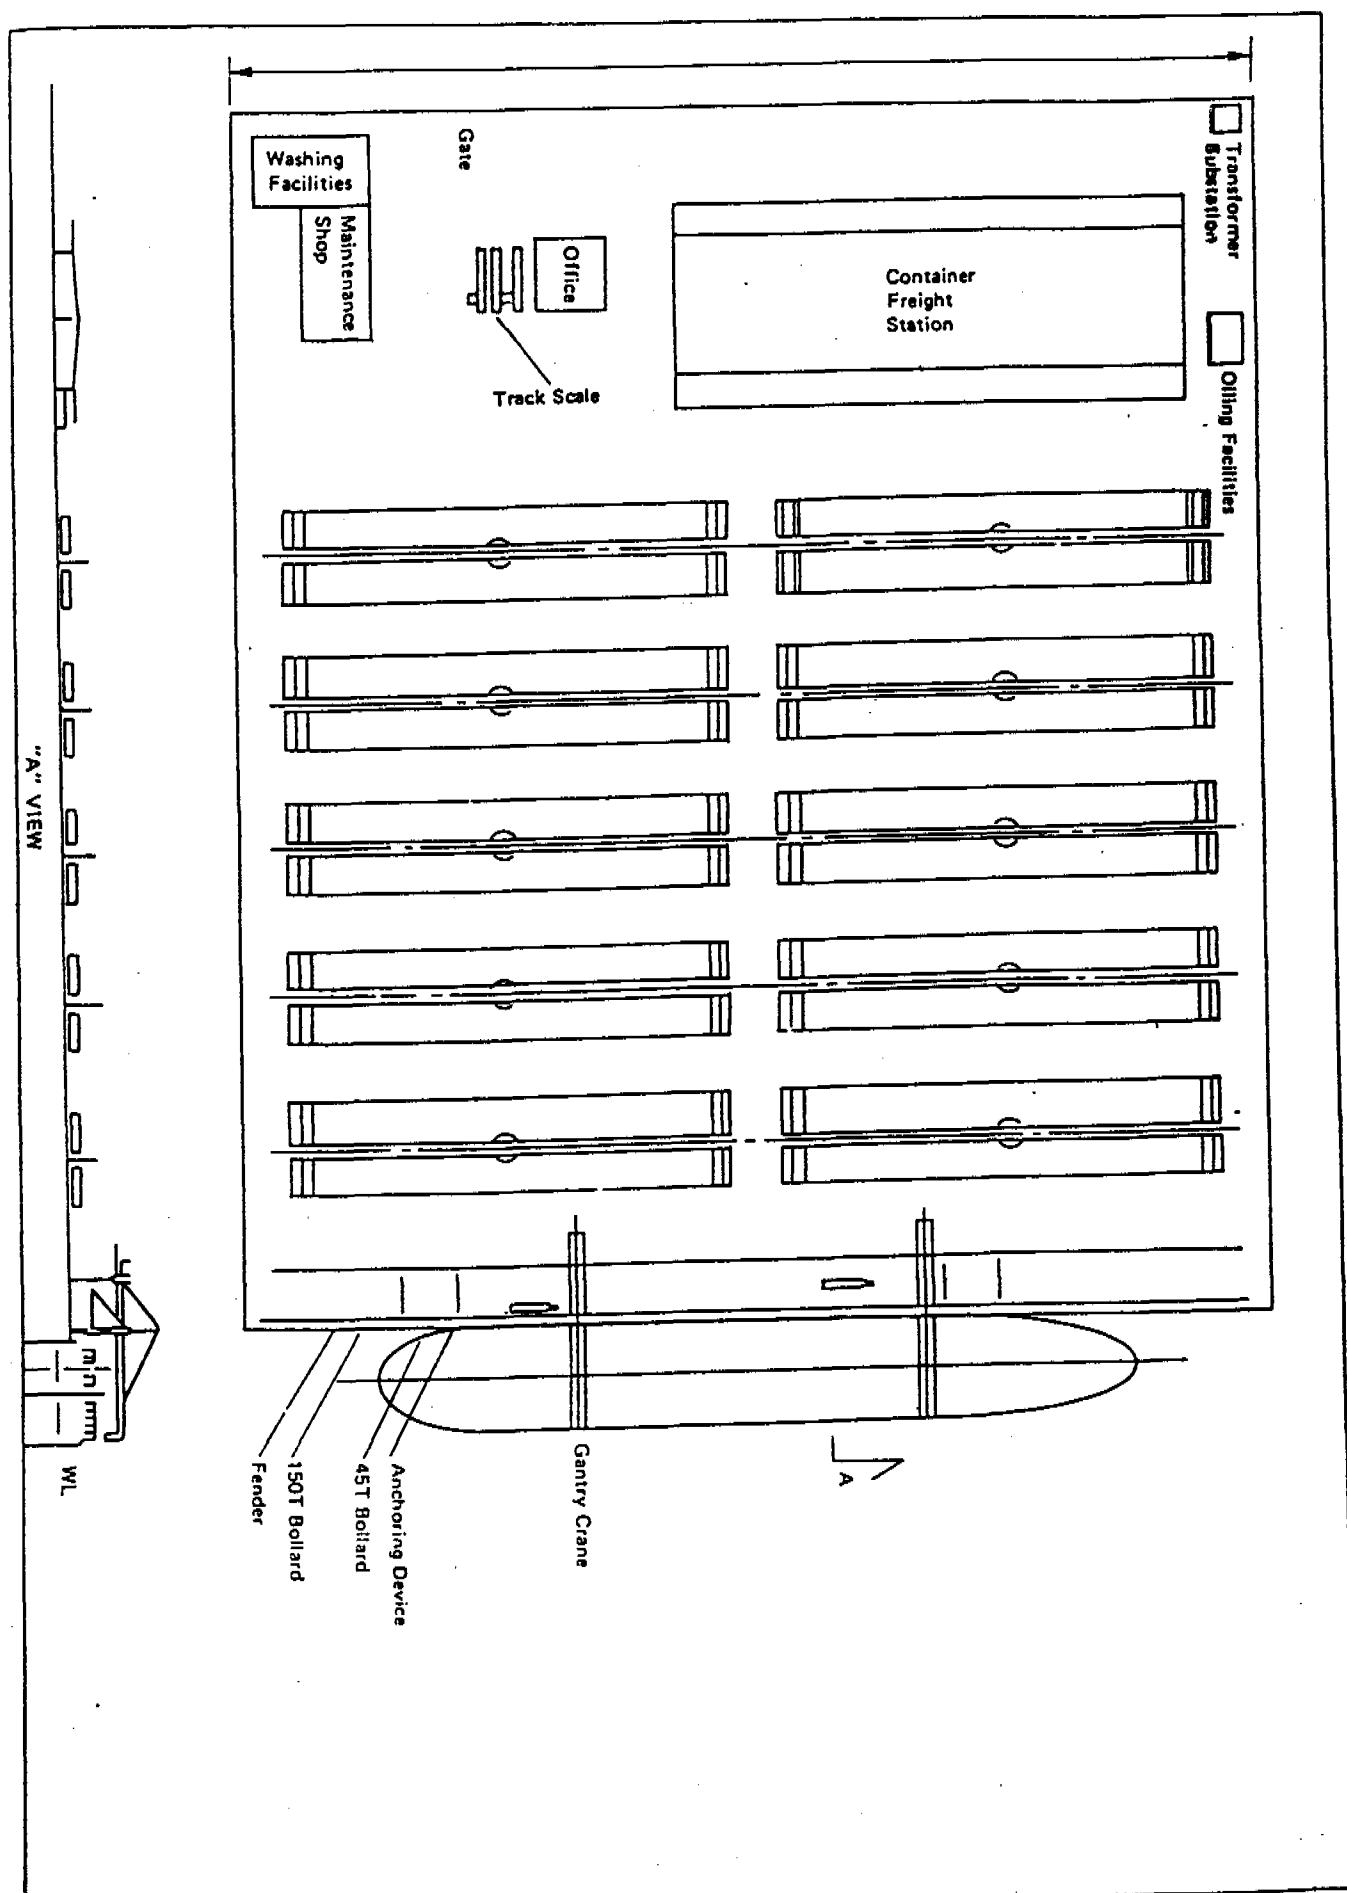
Container Terminal Layout (Straddle Carrier System)
